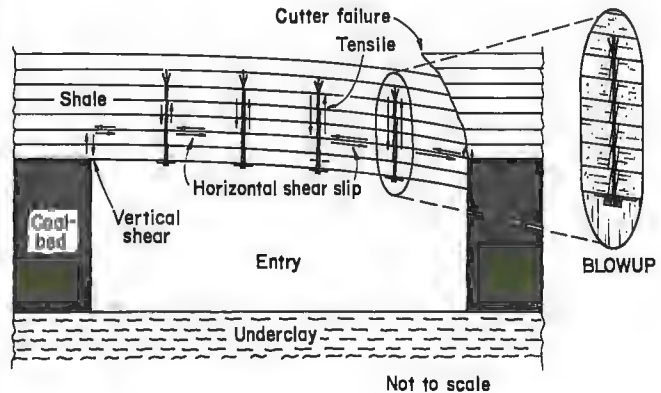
Schematic of cantilevering mine roof failure (8).
